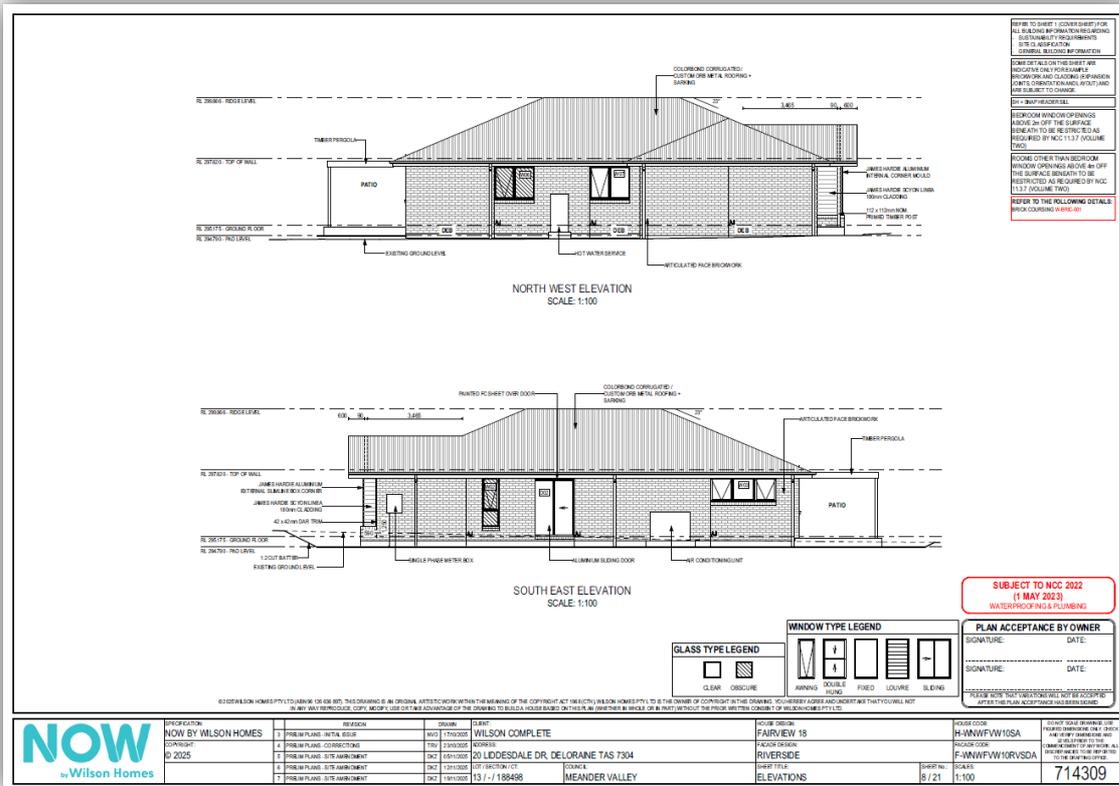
Elevations of proposed dwelling (provided by Wilson Homes).
